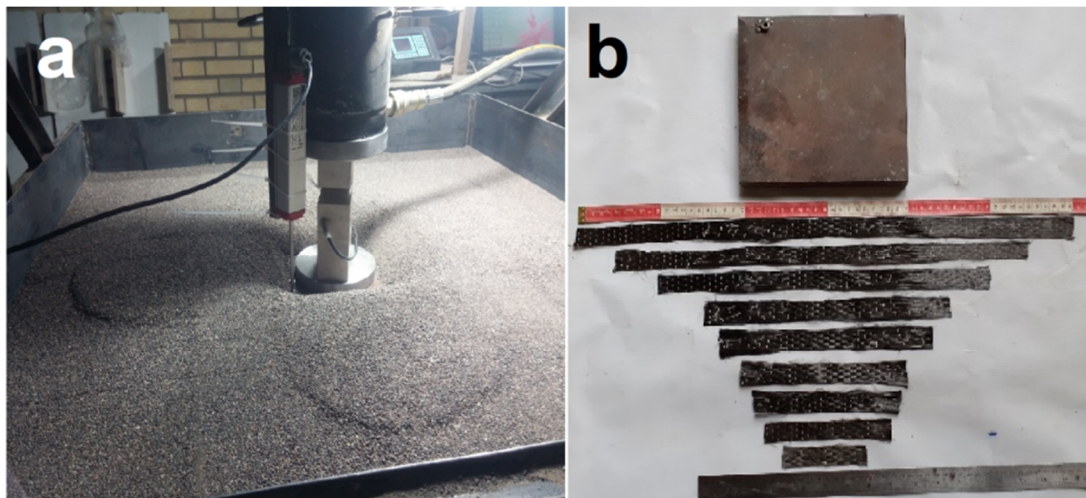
a) The failure of soil under loaded spread footing, b) disruption of CFRP strips under the footing
